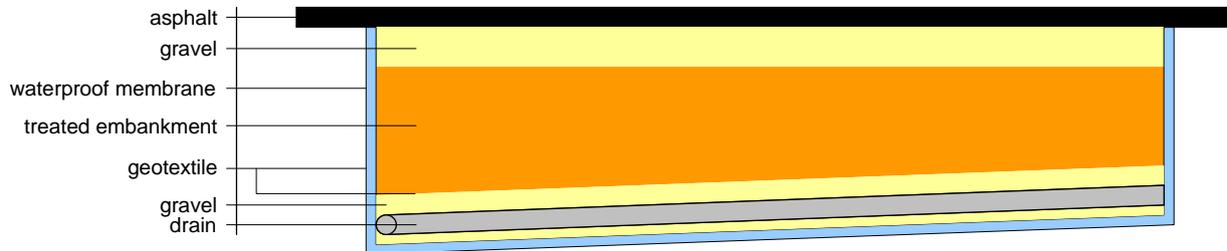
Profile of road structure for the test of lime-based binder used in treated embankment.
